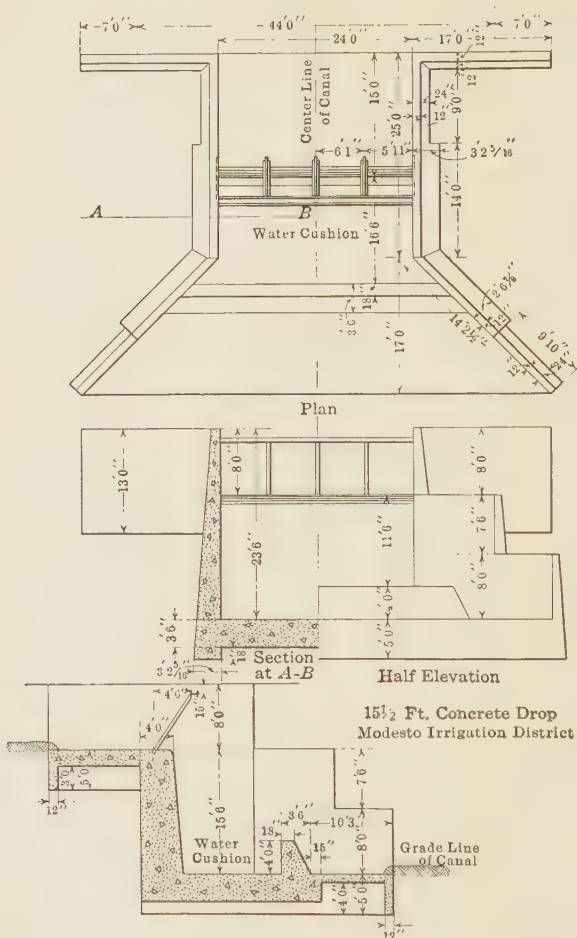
Concrete drop. Modesto Irrigation District, Calif.
